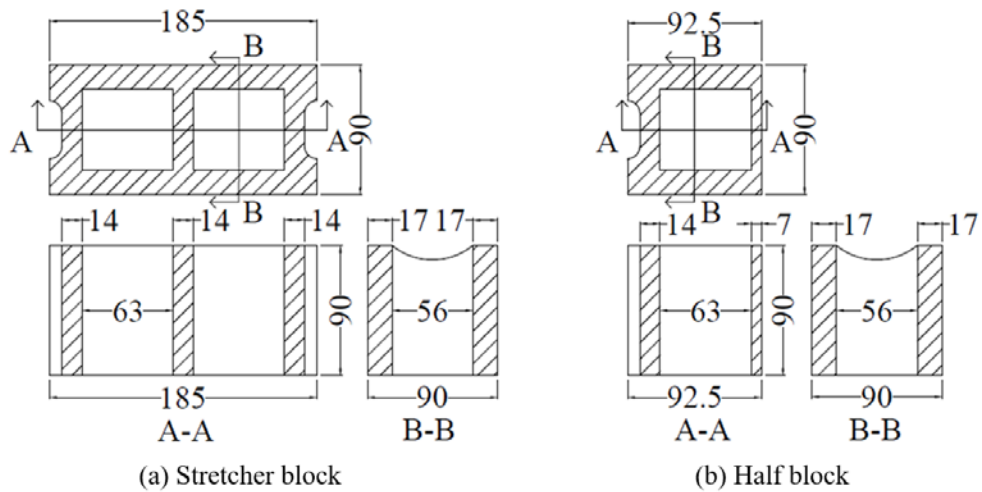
Details of Half-Scaled CMUs (unit: mm)
